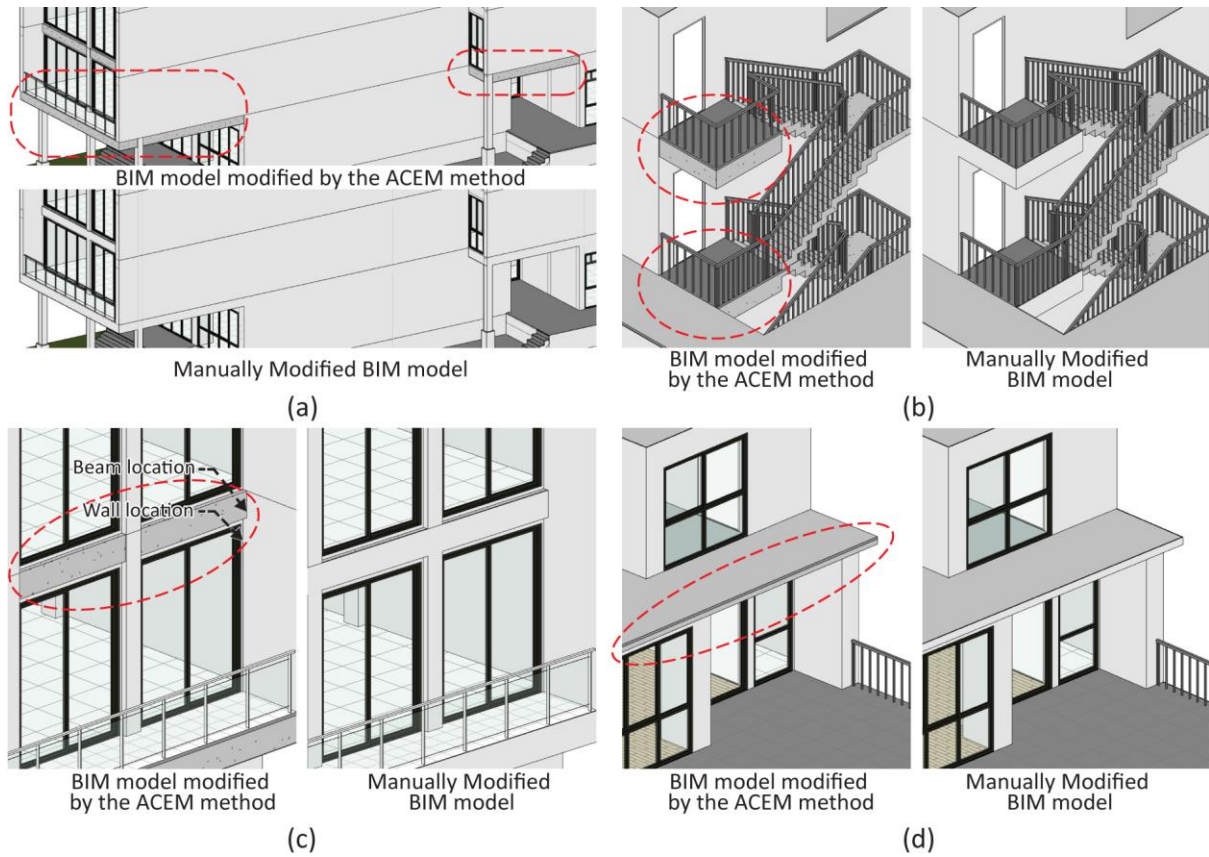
The ACEM prototype system did not create walls that are exterior wall finish on (a) the surfaces of beams that do not attach to walls, (b) the surfaces of beams that extend from the building, (c) the surfaces of beams that do not align with the surface of exterior walls, and (d) the surface of floor edges that extend from the building.
